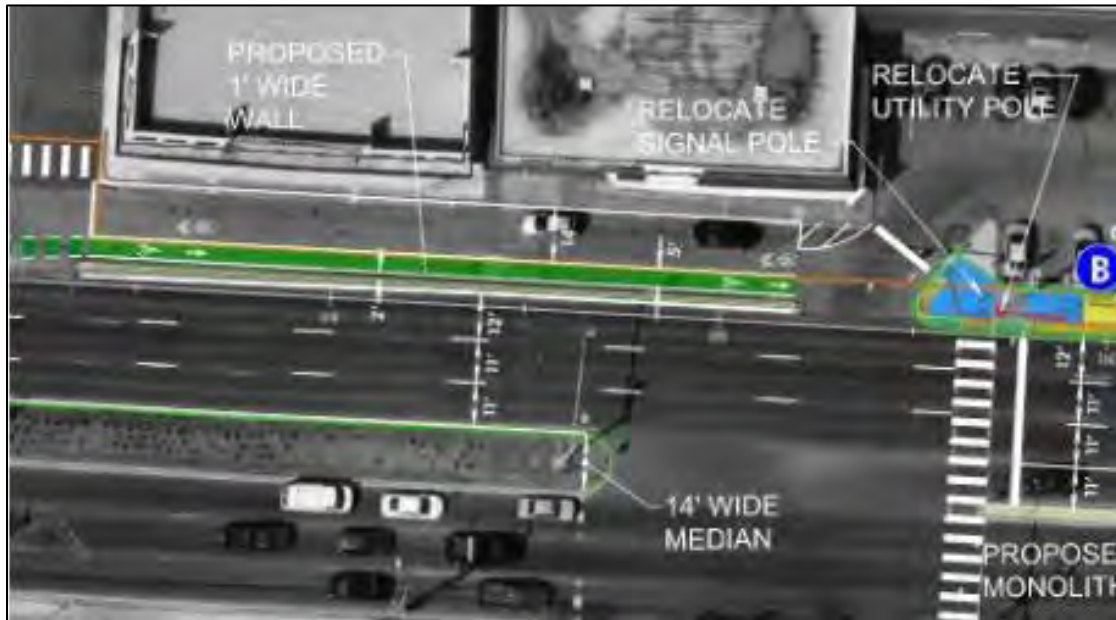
New Ave Bikeway at Auburn Avenue – Proposed Design
